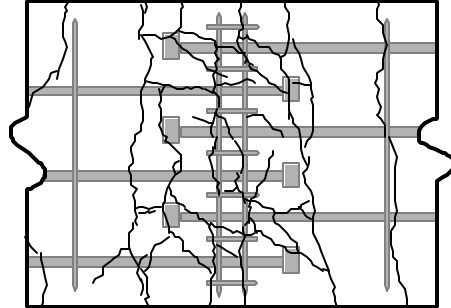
Crack development in the transverse stirrup cage test (specimen LS-08-04.04-12-10(N)-1-TTD) (continued)
